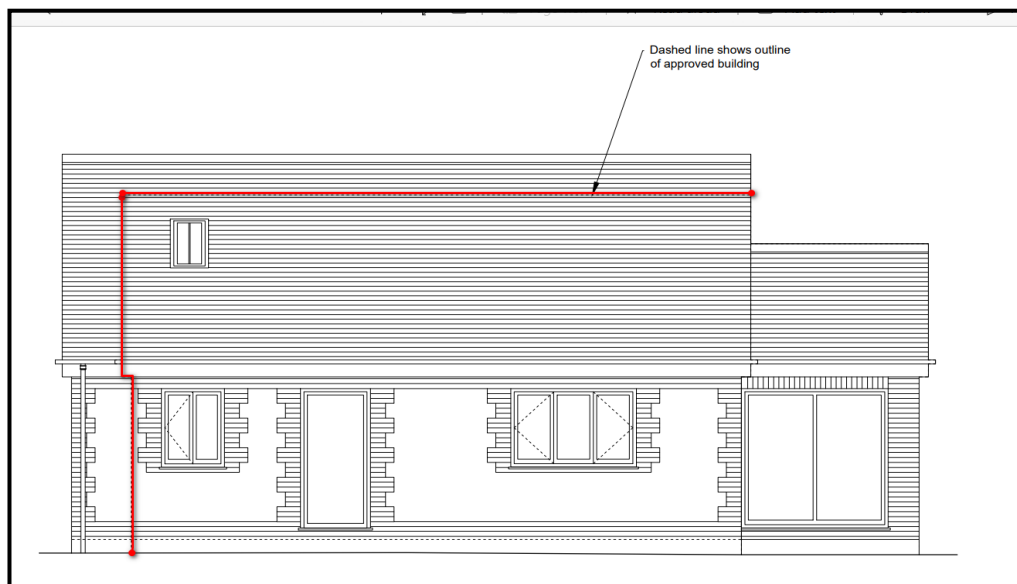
southwest side elevation - red line shows originally approved dimensions
